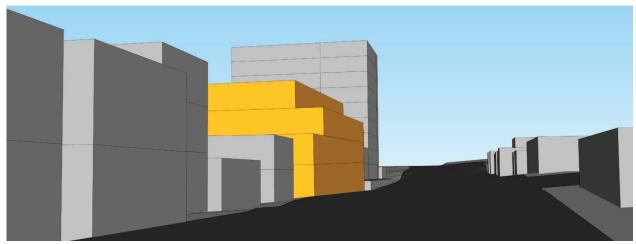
Recommended 3D Building Envelope - View from Macpherson Street looking west
